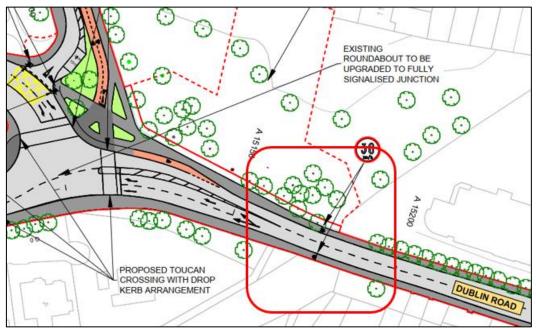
Extract from General Arrangement Drawings at the Bridge, Dublin Road (Sheet 43)
